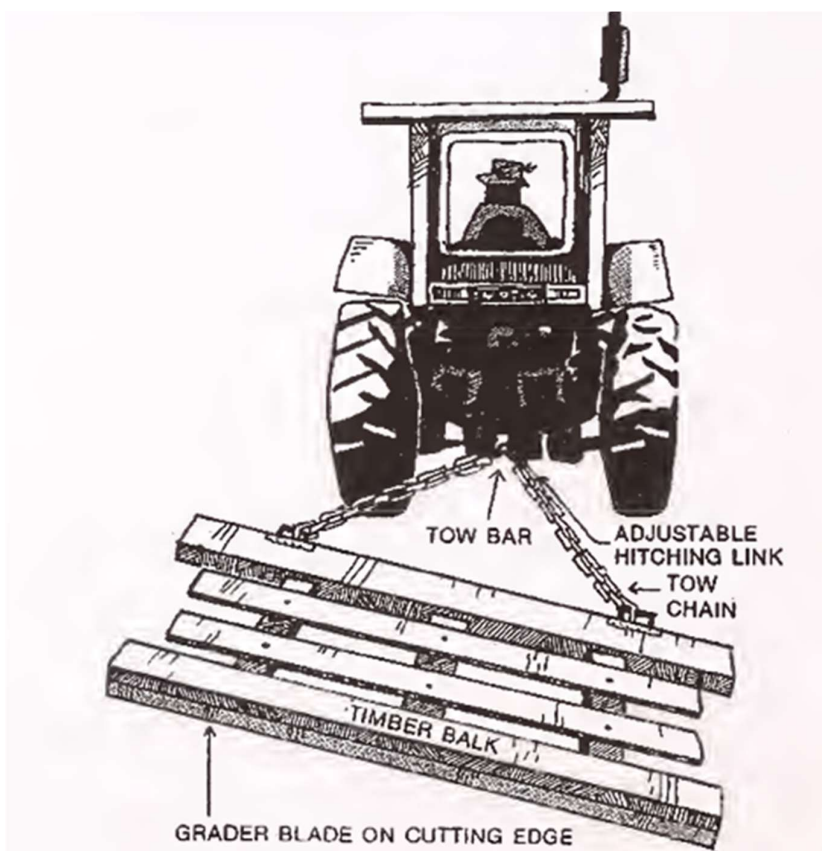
Typical Tractor Towed Drag (Source: Unsealed Roads : A Manual of Repair and Maintenance for Pavements, National Roads Board, New Zealand)
